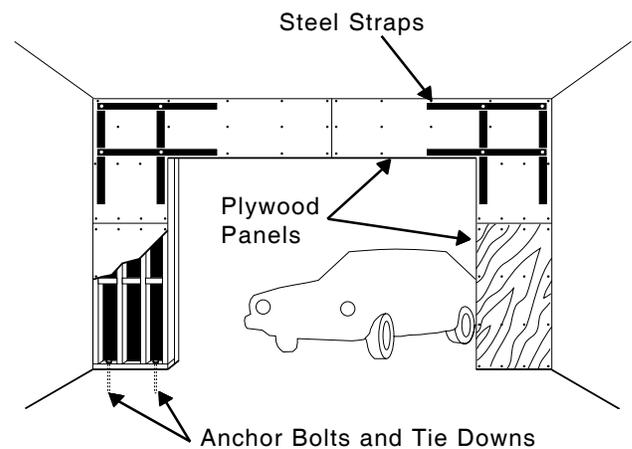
Bracing garage walls. If your house has a room over the garage, the garage walls may not be strong enough to hold up during an earthquake unless they are braced with plywood panels.
